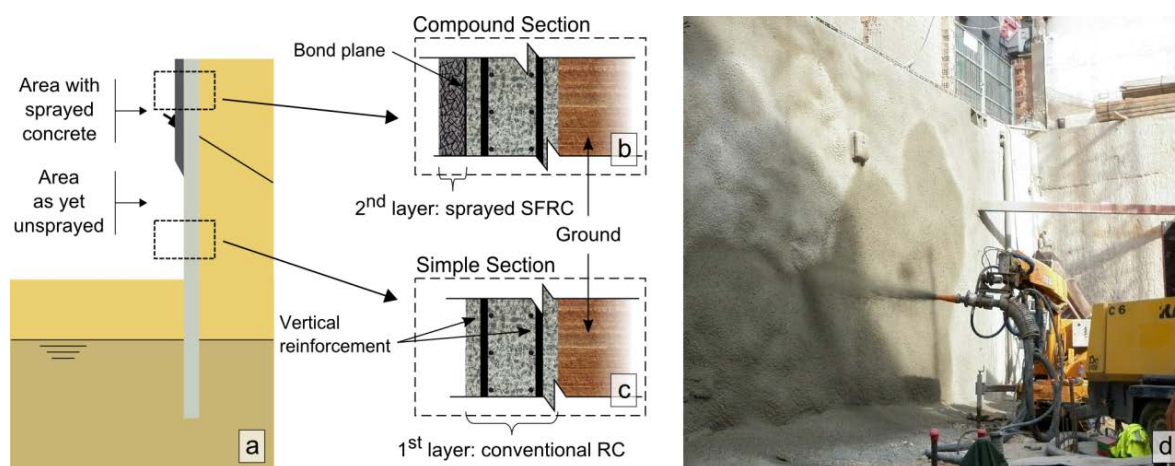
Bi-layer diaphragm walls. a) general scheme; b) compound section; c) simple section; and d) spraying of an experimental wall.
